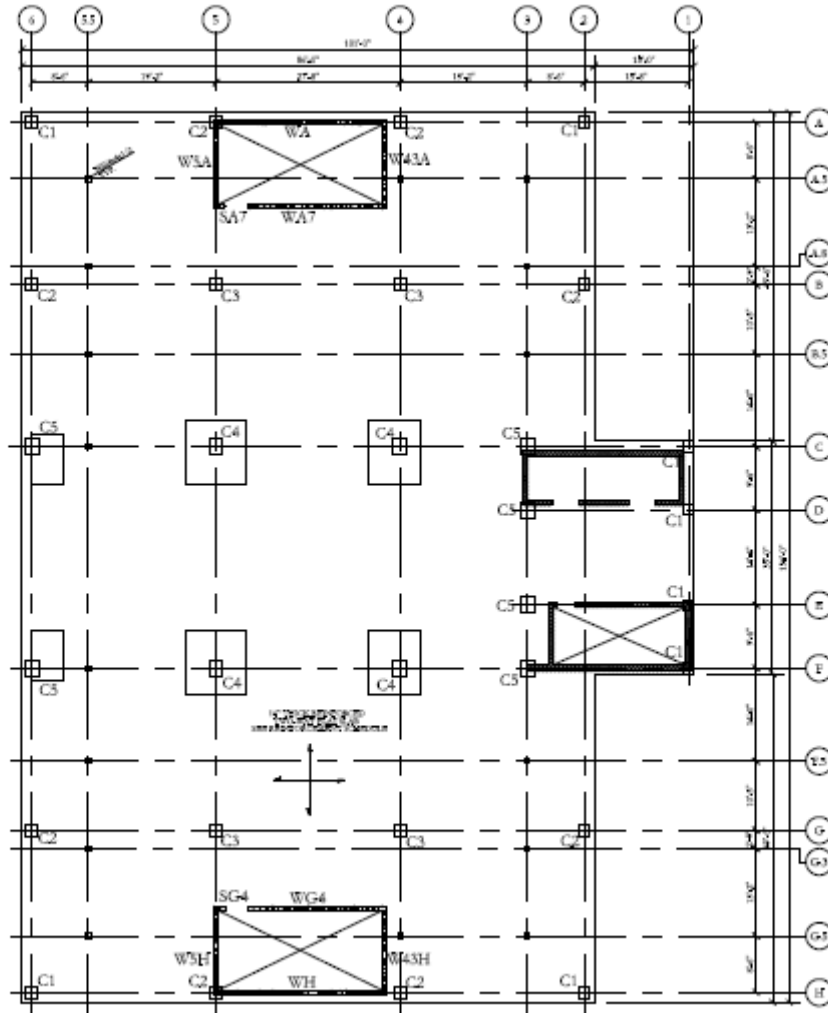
Proposed Concrete Structural System 5th Floor Framing Plan
